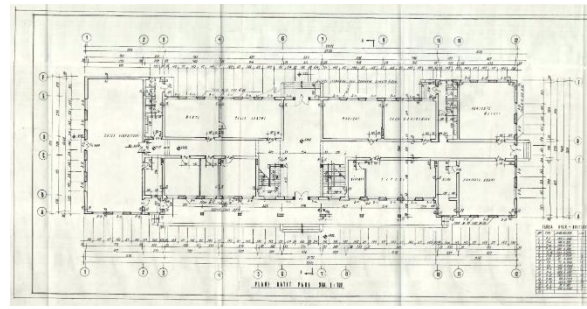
The floor plan of the “20 December School” (Technical archive of Tirana, Albania)
